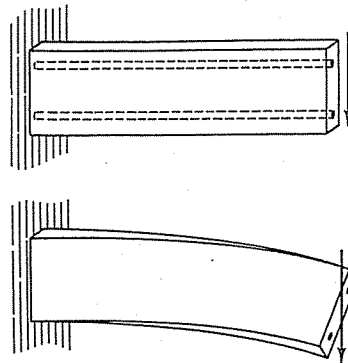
A beam of very narrow width may twist under load. The twist could be a critical problem for a beam reinforced with high-strength rods.
